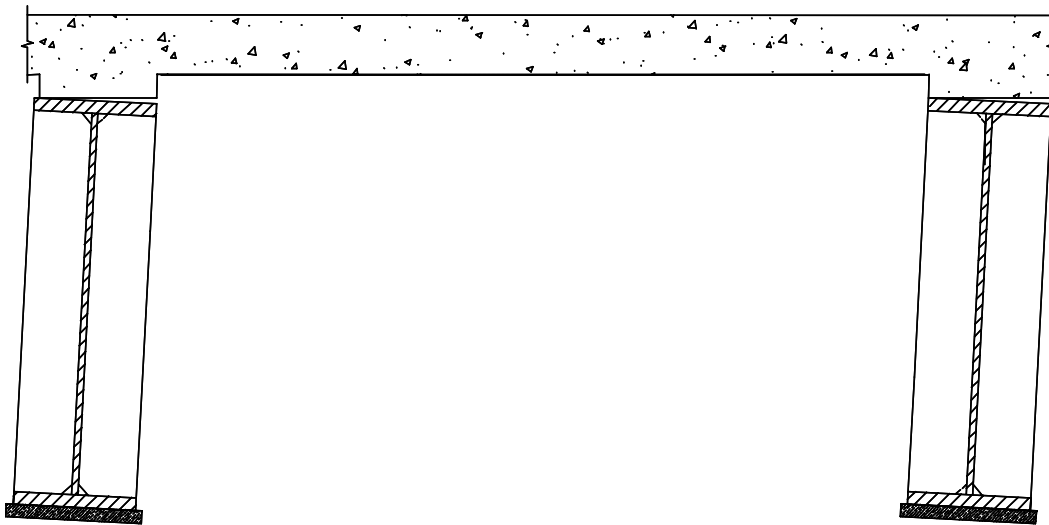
Deformed end region of two girder bridge with "rocking" girders
